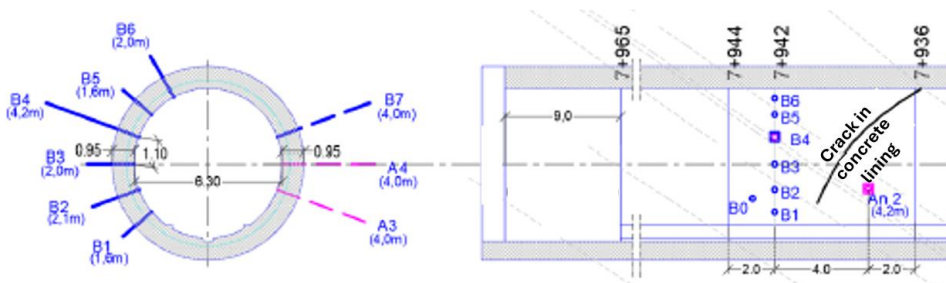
Overview of initial anchor installation and grouting works in the section from chainage km 7+944 to 7+936.
